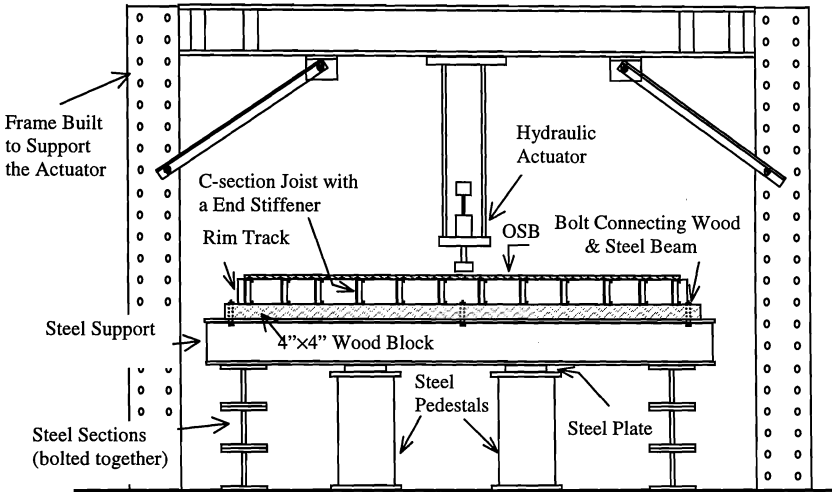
End detail of floor set-up (fl-6.114-2-6"-1/5-B0)
